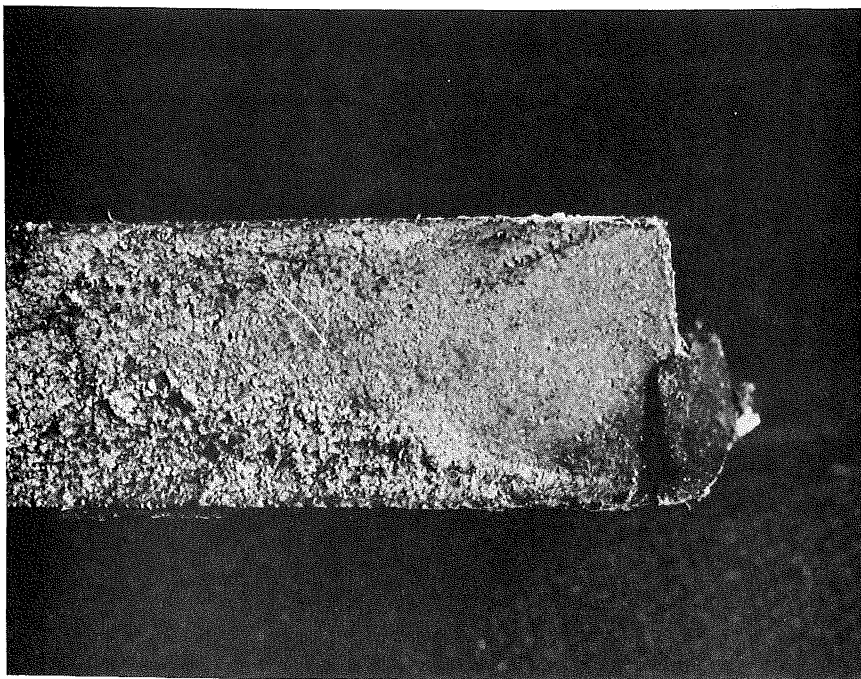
Example of Crack-Initiation from the Flange-Tip
